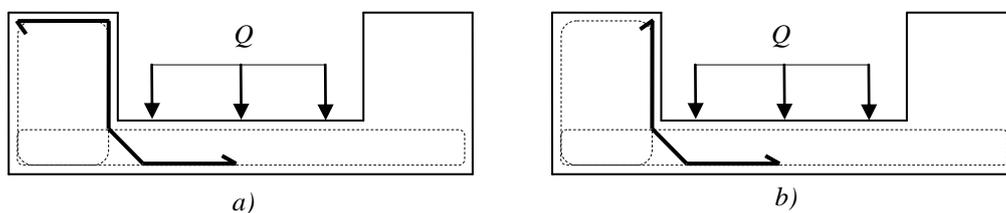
Suspension reinforcement in a through bridge, a) correct design where the horizontal leg provides sufficient anchorage, b) not correct design.
